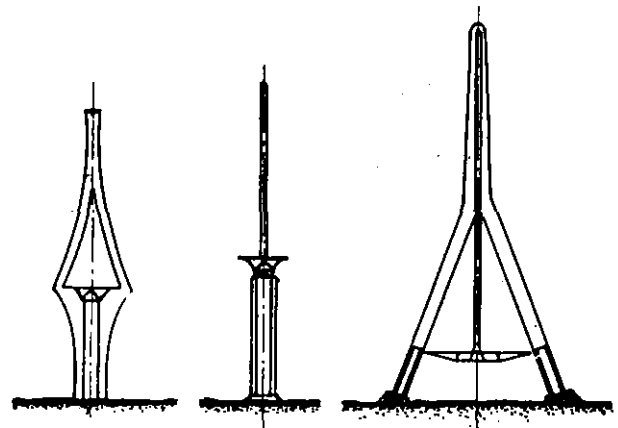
Transverse arrangement of pylons... One axial layer of stays
